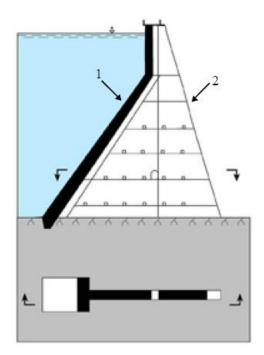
Schematic sketch: cross section of an earth/rock-fill dam
